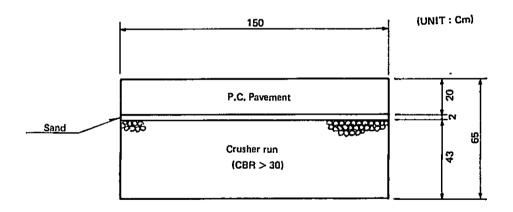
P.C. Pavement for the Course of Transfer Crane
